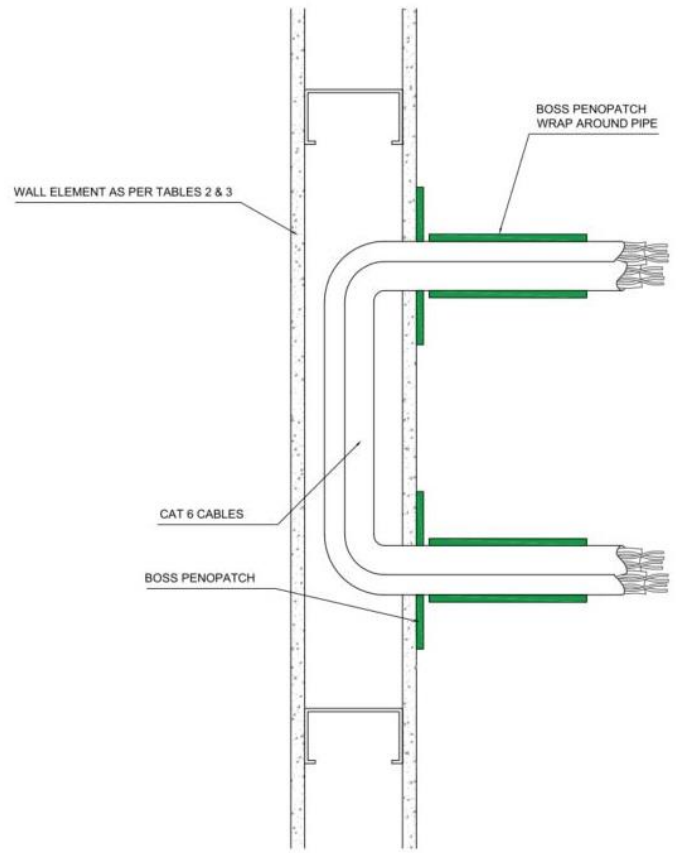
Cable Penetrations penetrating the wall without exiting to the other side
